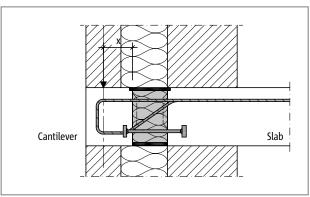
Schöck Isokorb® XT type O: Corbel with faced masonry
